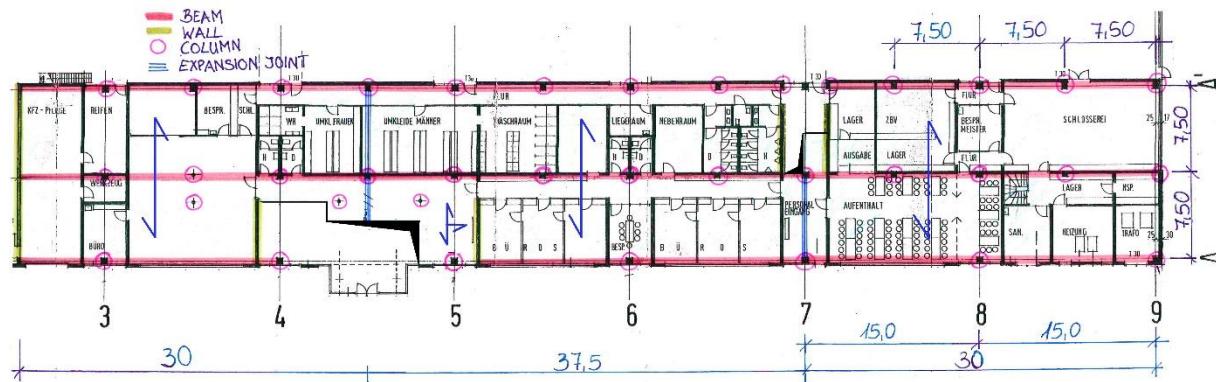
Proposal of a Combination of a Slab-Beam System and a Flat Slab
